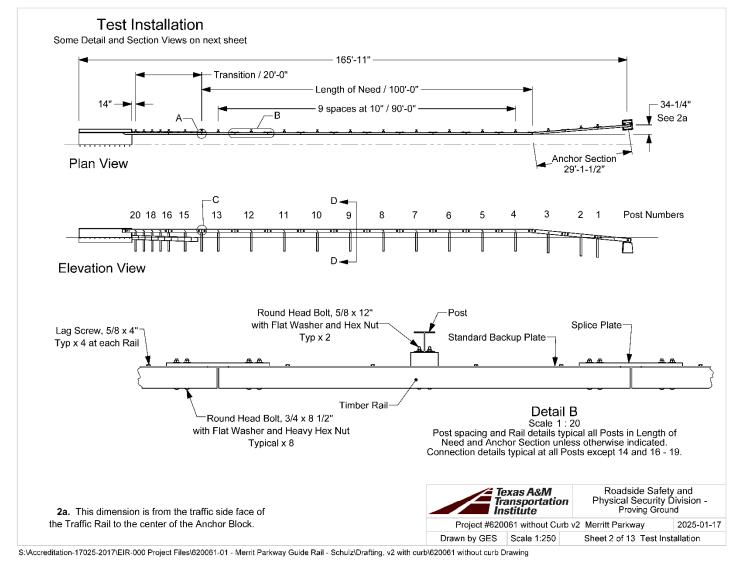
Details of Merritt Parkway Guiderail for Test 620061-01-4.
